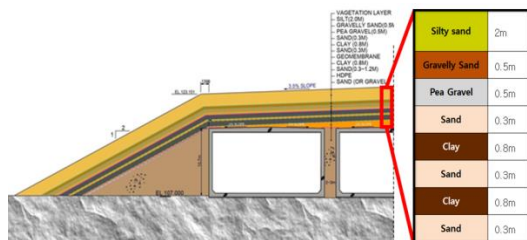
Configuration of multiple engineered layer cover in Wolsong LILW 2nd stage disposal facility.
